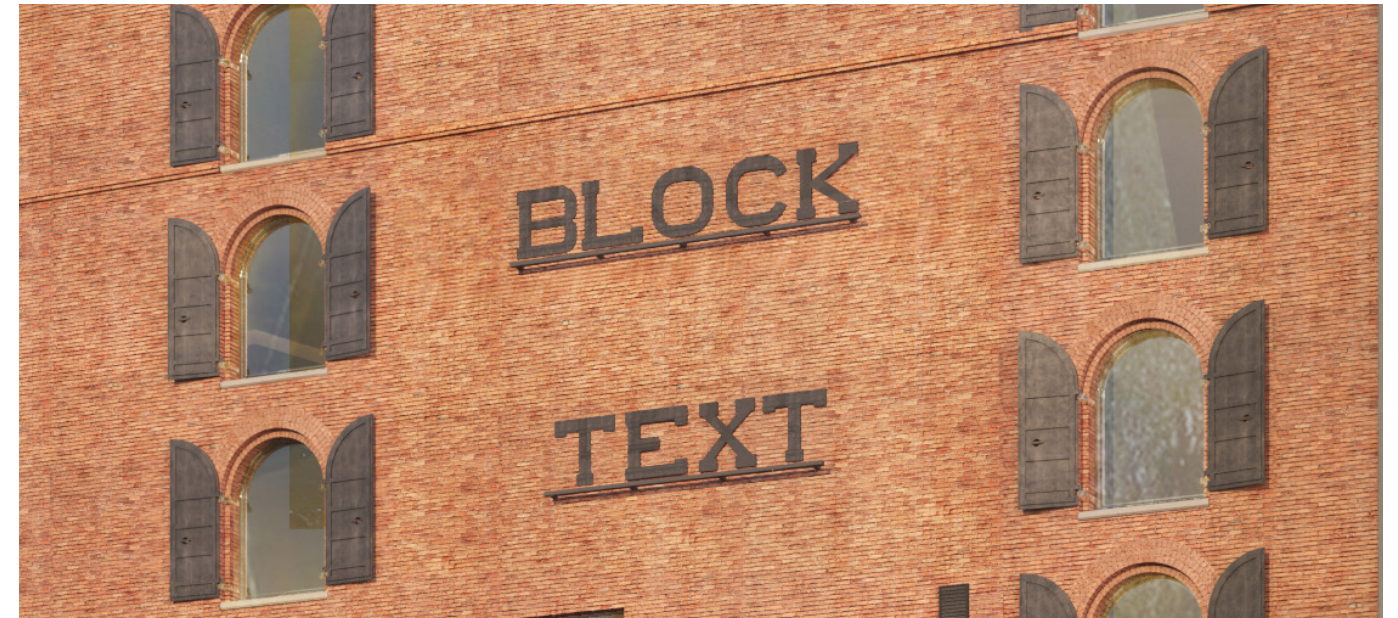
DETAIL OF CONNECTION DETAIL W/ RAIL-MOUNTED LETTERS
